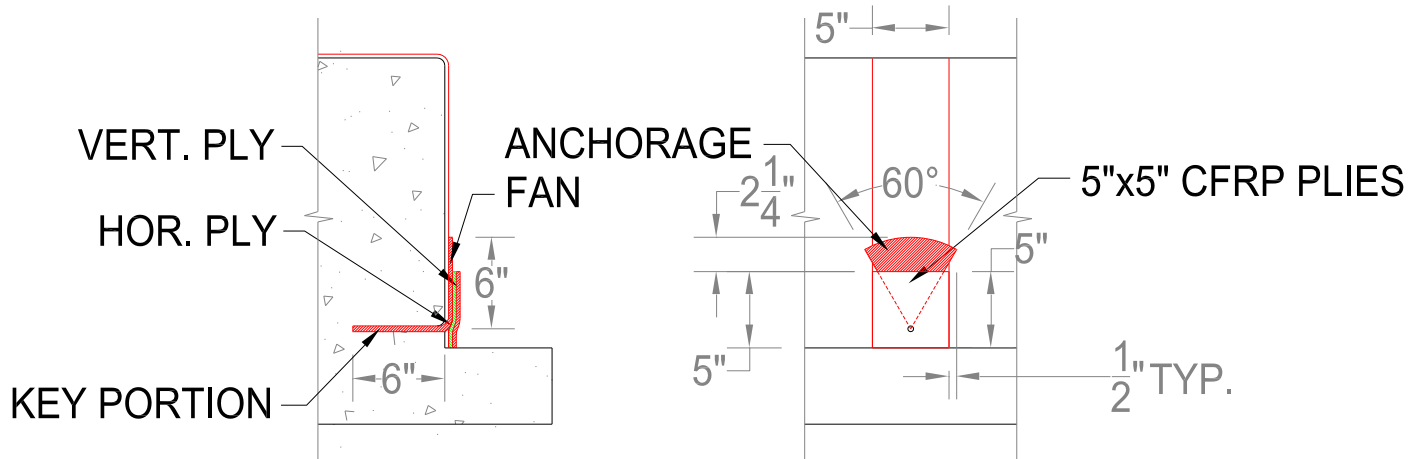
A CFRP anchor detail (Quinn, 2009)
